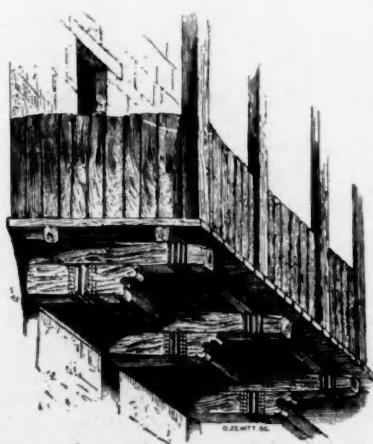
DETAIL OF WINDOWS AND CORBELLING FOR CHIMNEYS—COCCAGLIO.
